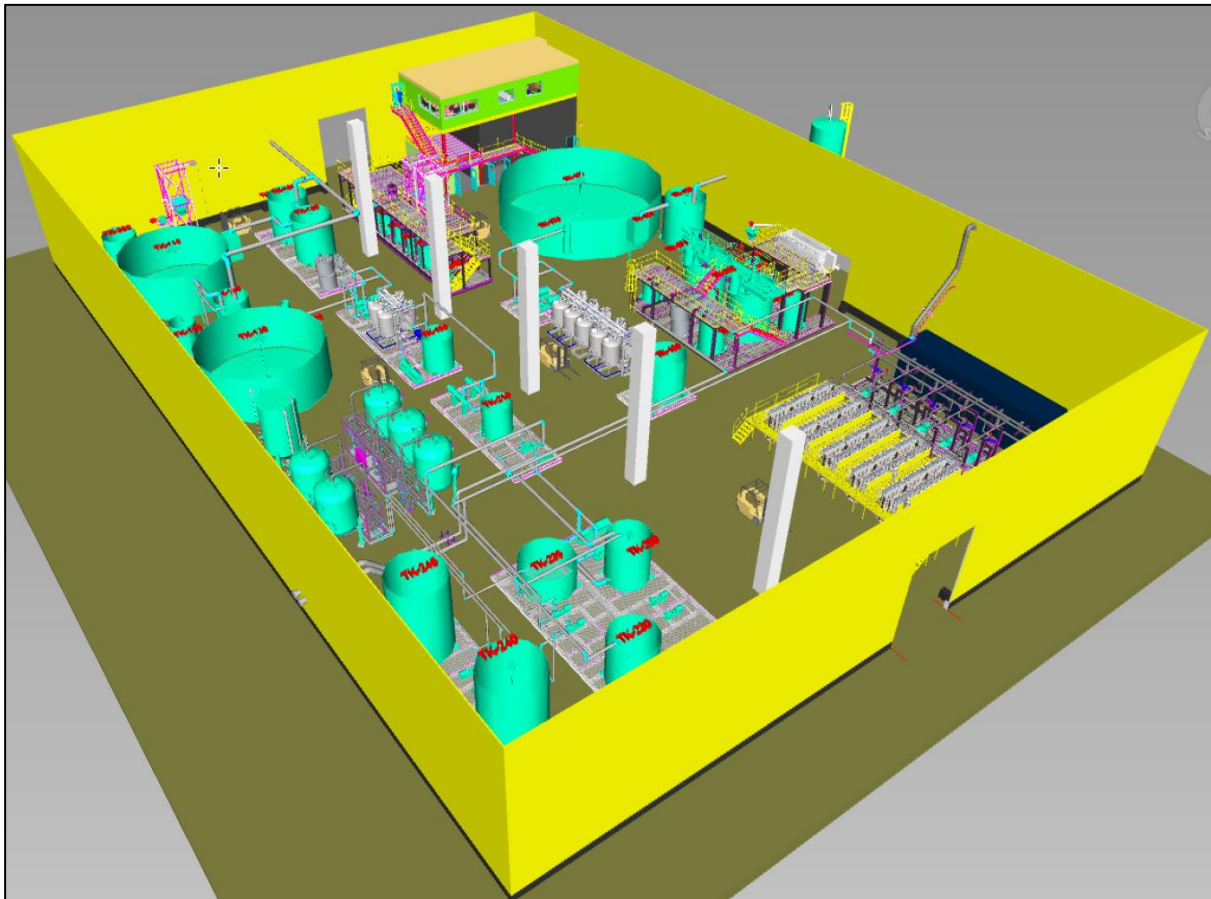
Isometric view of 3D model of the water treatment plant design
